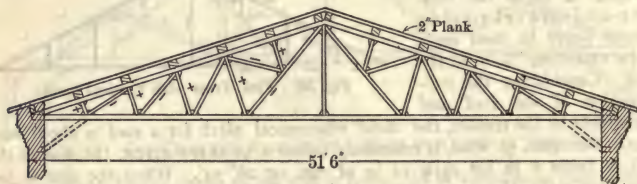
Fink Truss. Span Fifty-one Feet Six Inches
